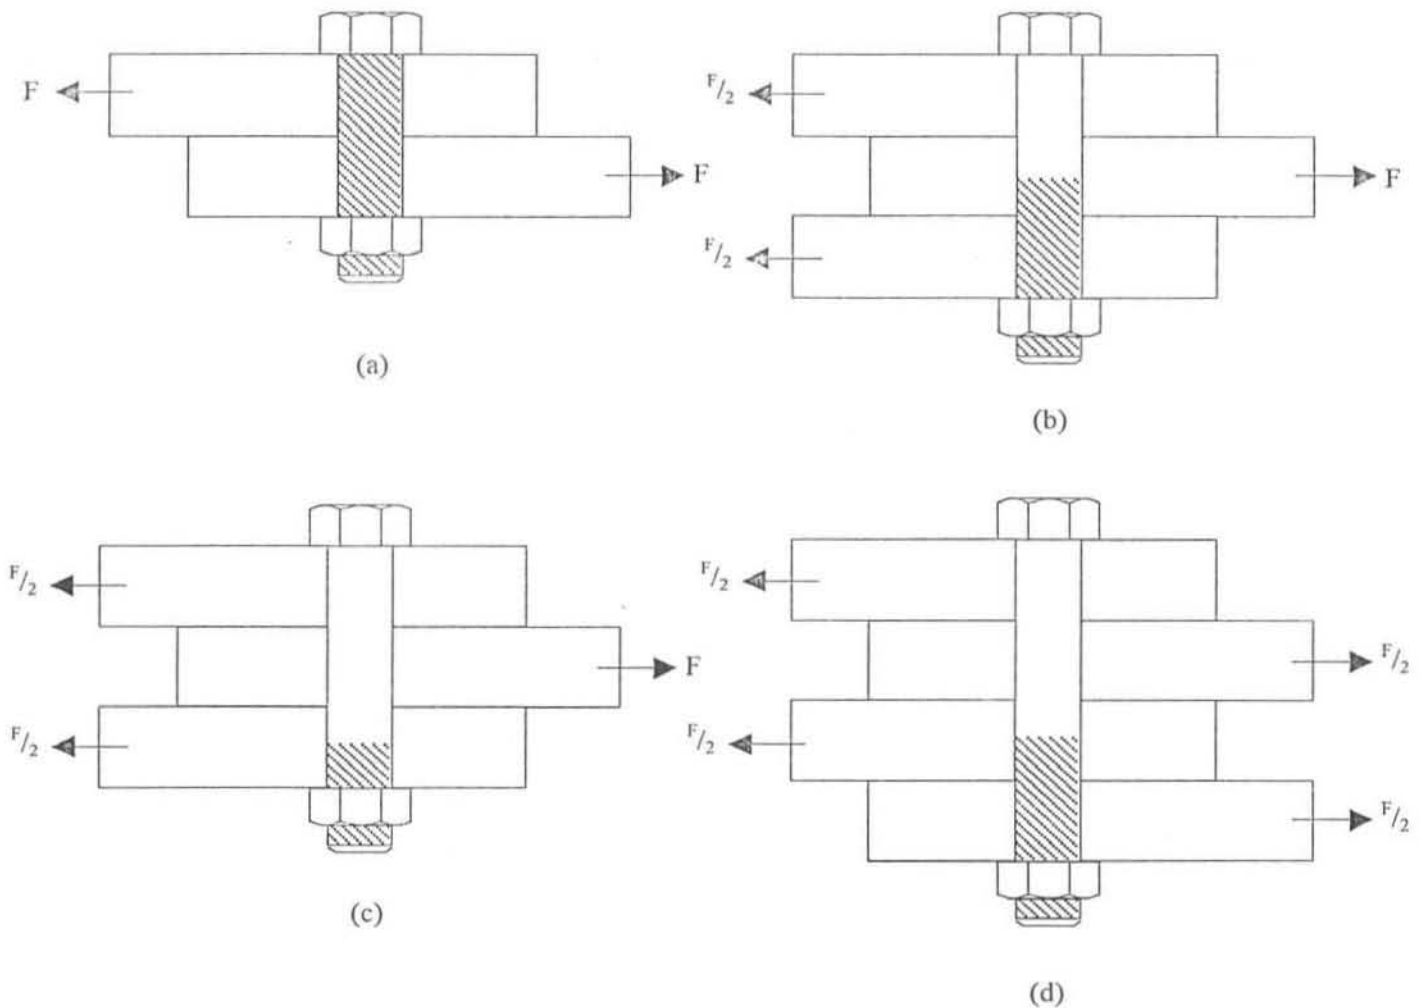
Possible shear loading conditions on a bolt in a structural joint
